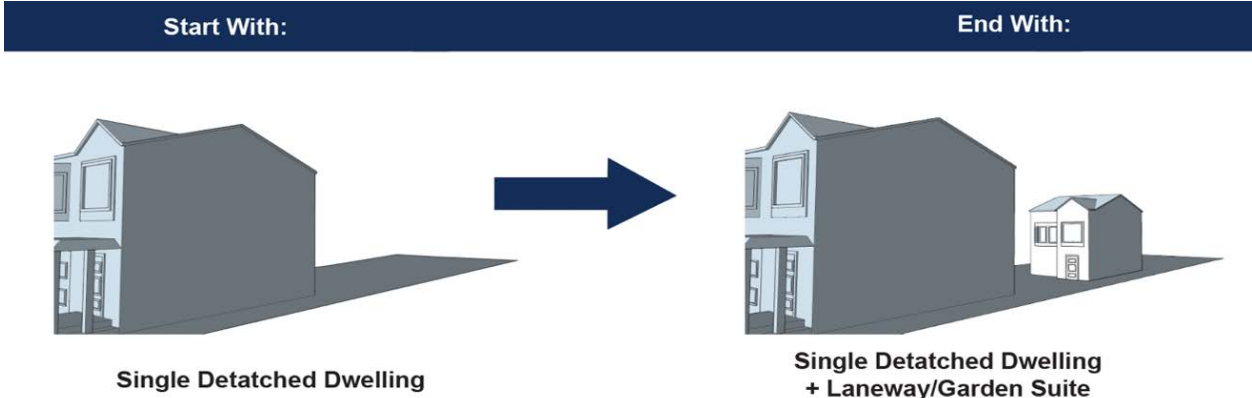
Laneway Suite/Coach House/Garden Suite Example
